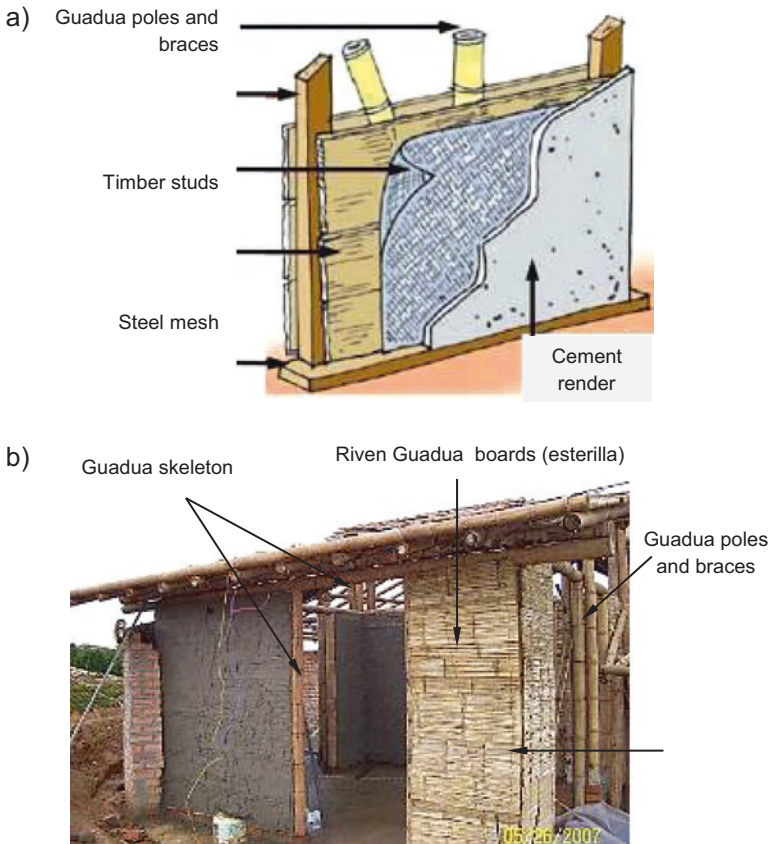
Plastered cane wall framing system with parts diagram. (a) Typical frame section with timber and bamboo elements. (b) Typical wall-roof framing with bamboo. (Image (a) taken from (Farbiarz et al. 2002))
